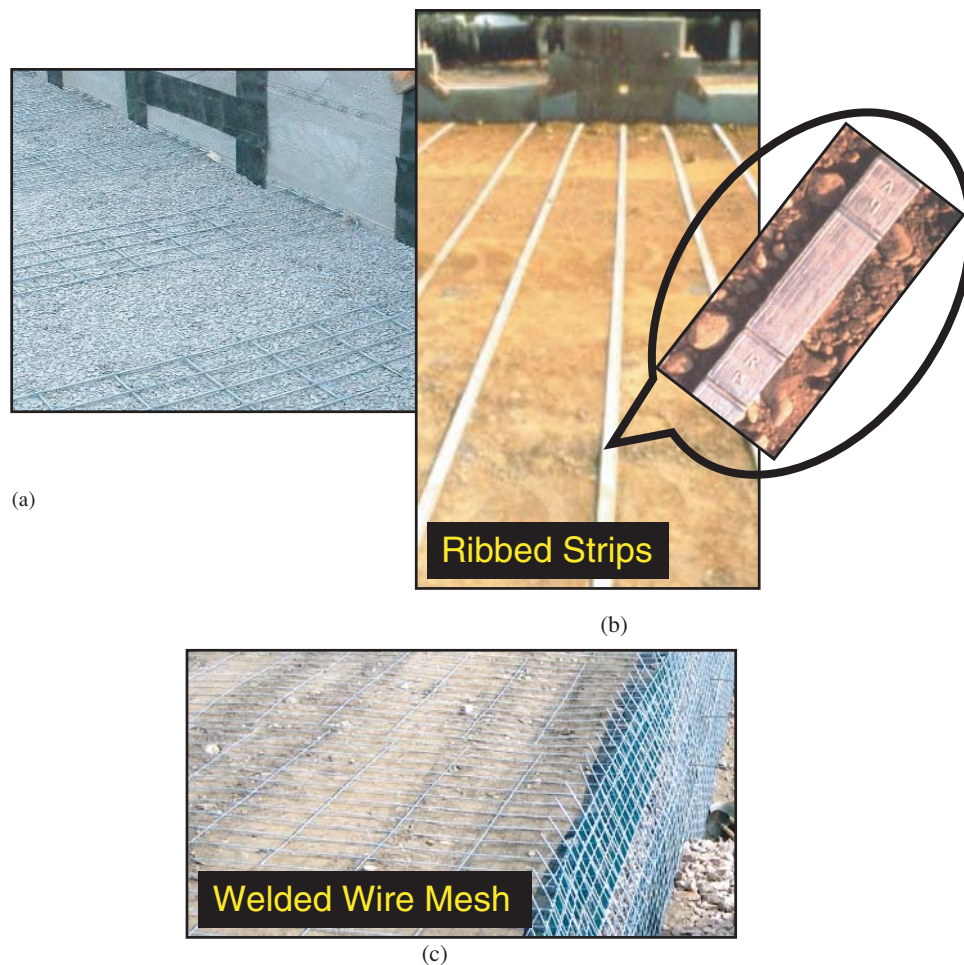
Examples of metallic reinforcements used in MSE construction: (a) bar-mat grid reinforcements, (b) hot-rolled steel strip reinforcements, and (c) welded-wire grid reinforcements.
